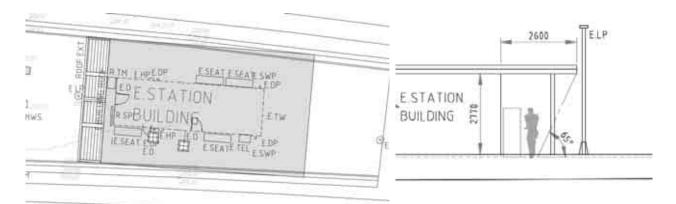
a) LEFT: Plan of awning extension; b) RIGHT: Elevation showing awning extension
